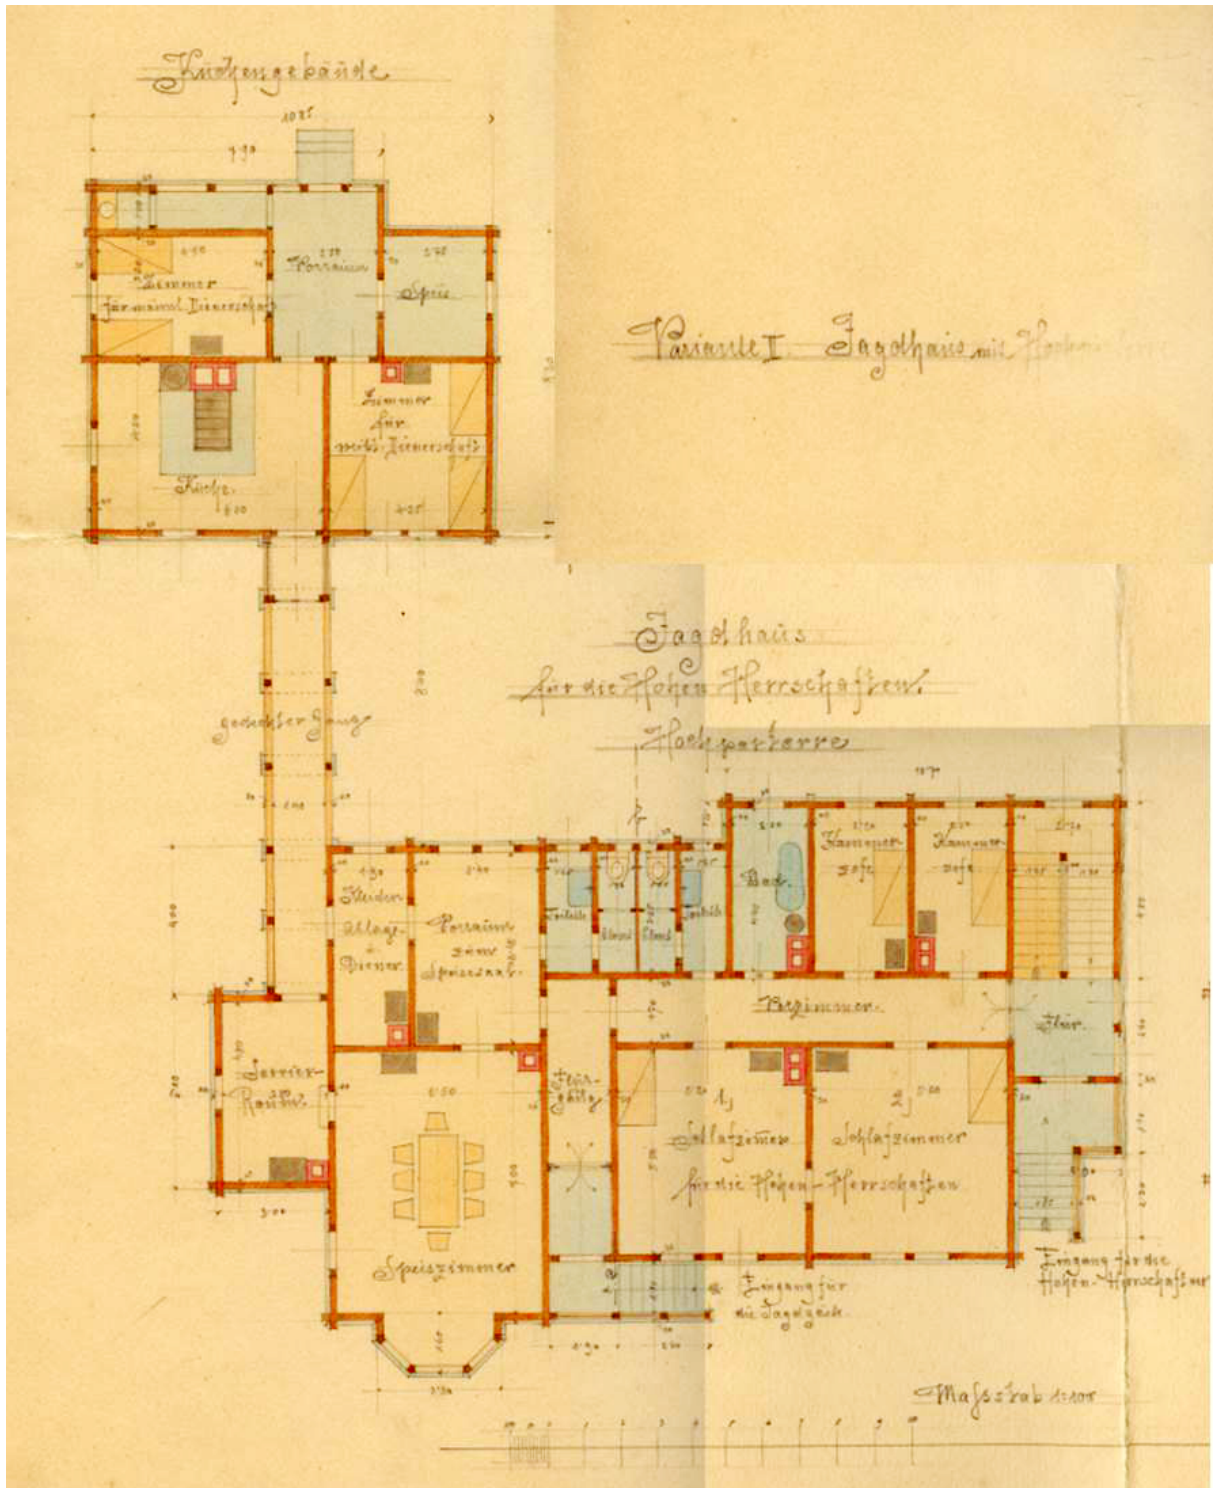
Plan of the first floor of the version II with the kitchen building. Source: from the collection of M. Makowski
